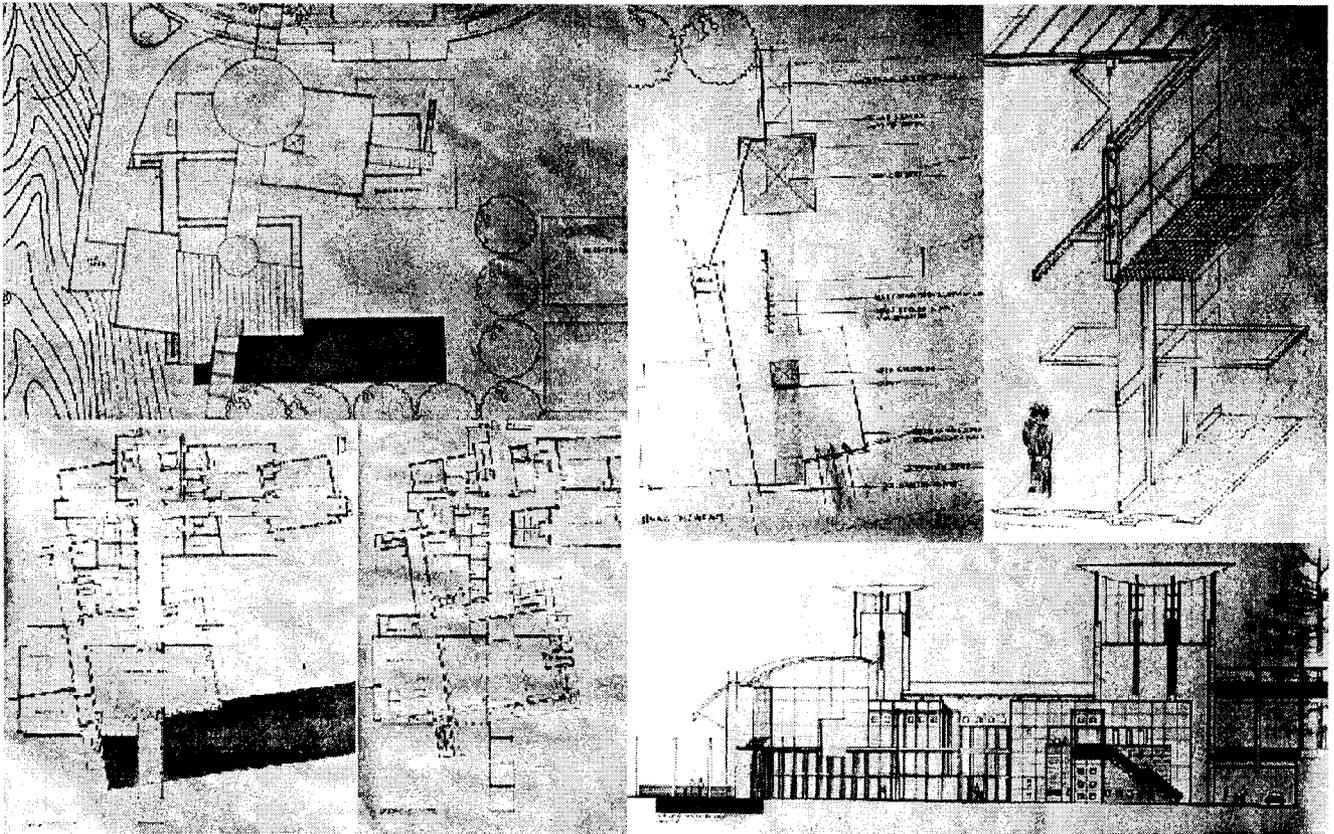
(a) Community Center2, Site Plan, (b) First and Second Floors, (c) South Wall Section and Shading Detail, (d) South Elevation (Stephen Parris, Third Year Student, Georgia Tech.
